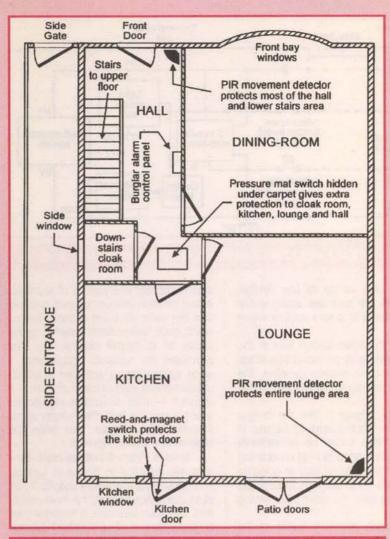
Ground floor plan of a semi-detached house, showing suitable positions for anti-burglary defenses.
